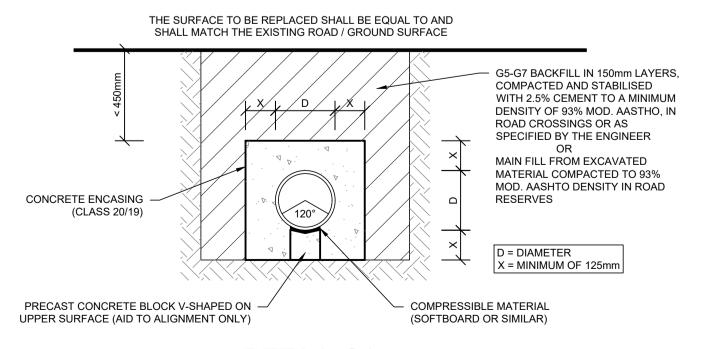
BEDDING FOR POOR NATIVE SOIL FOUNDING CONDITIONS
